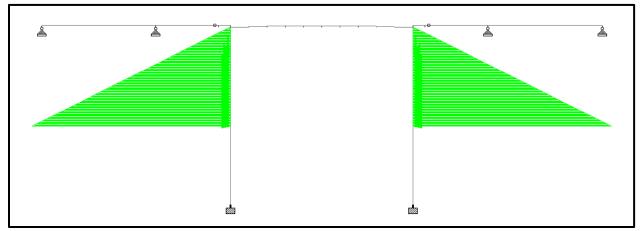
Lateral Earth Load on 20-ft. Abutment Wall
